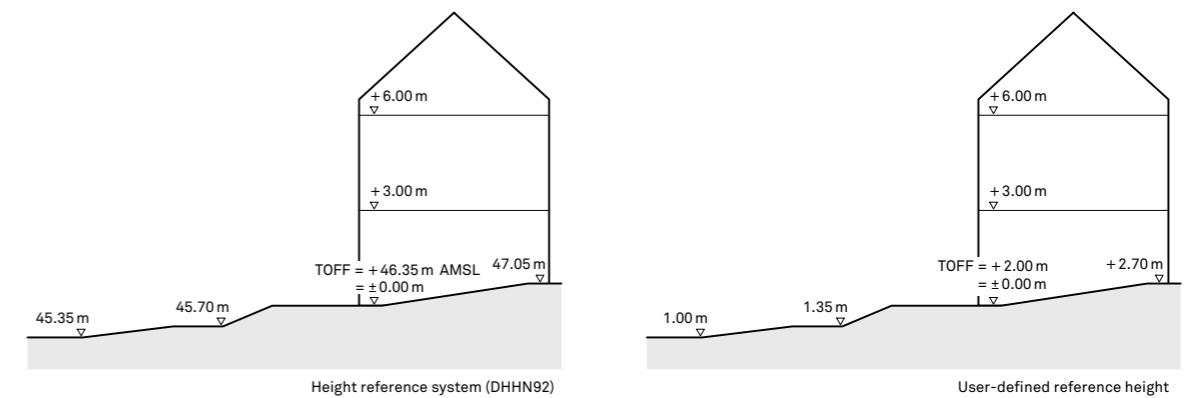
Finished elevations based on a height reference system and user-defined datum
